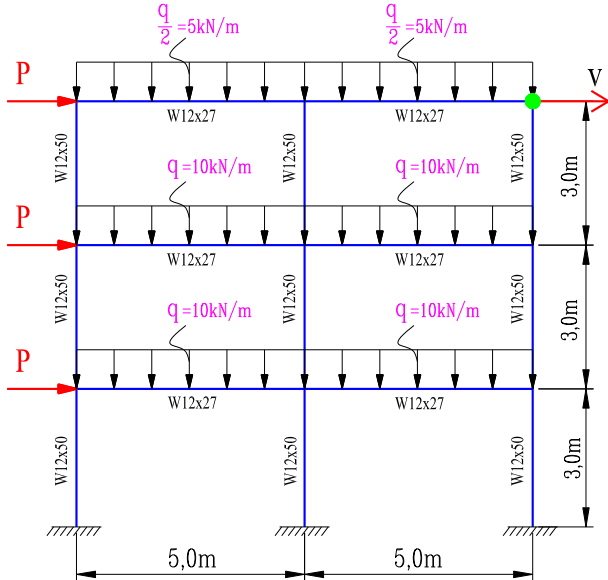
Li composite plane frame 3 floors and 2 spans
